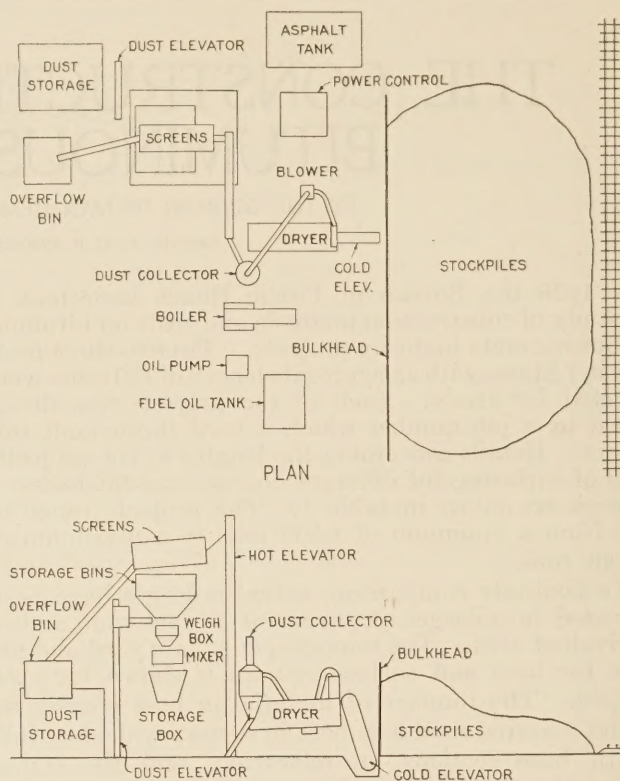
TYPICAL ARRANGEMENT OF MIXING PLANT.
